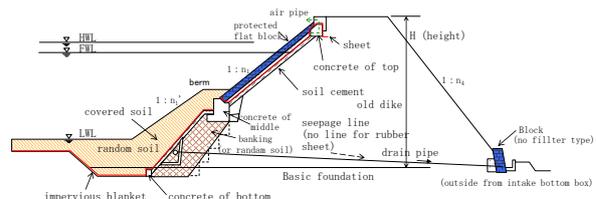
Outline of surface watertight sheet pond type (embedded sheet type)
